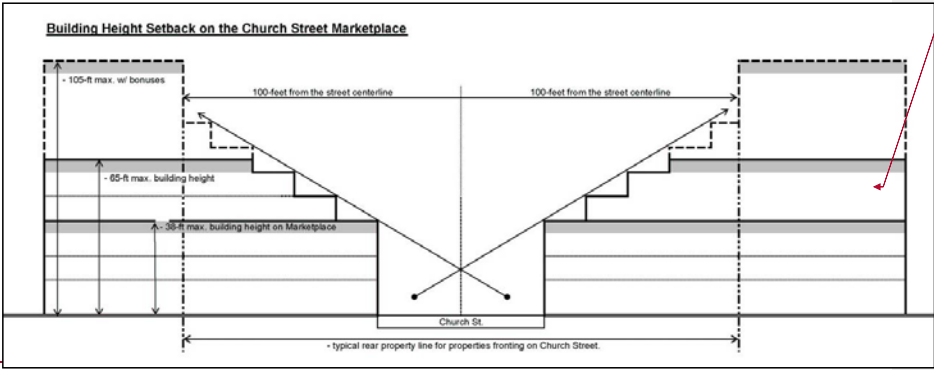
2 Measuring Height Limits for Church Street Buildings
